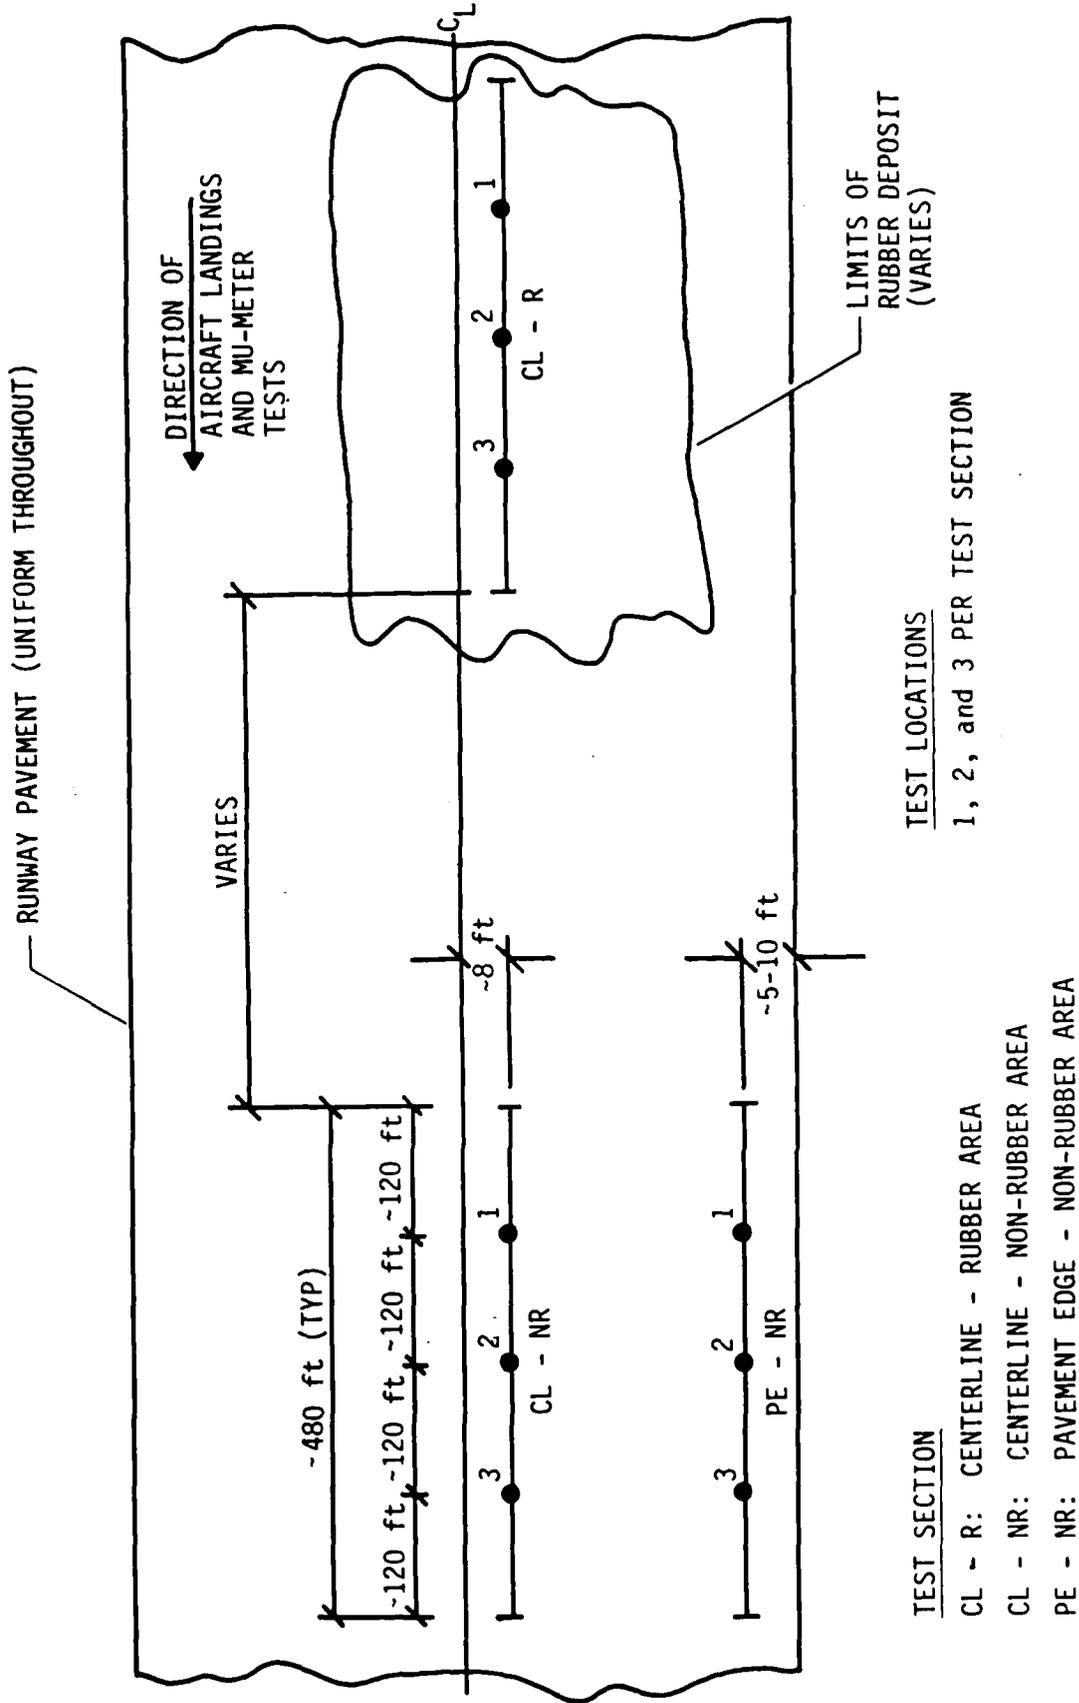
TYPICAL TEST SECTION LAYOUT (REFERENCE 4)
